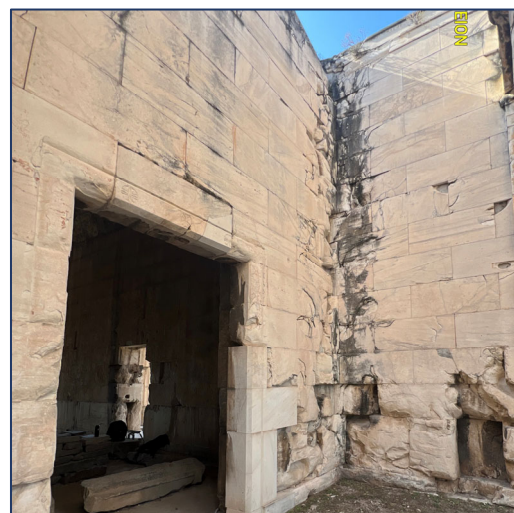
Photograph taken in 2025 of the water damage to the southeast corner of the west peristyle.
